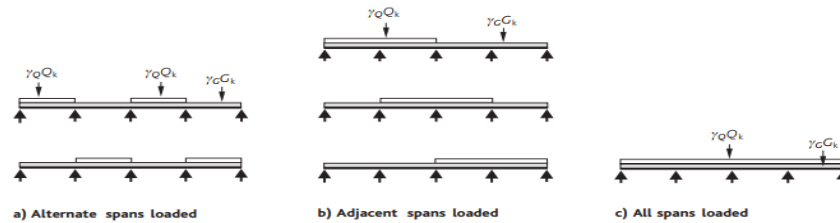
Load arrangements for beams and slabs according to UK NA- EN1992-1-1
